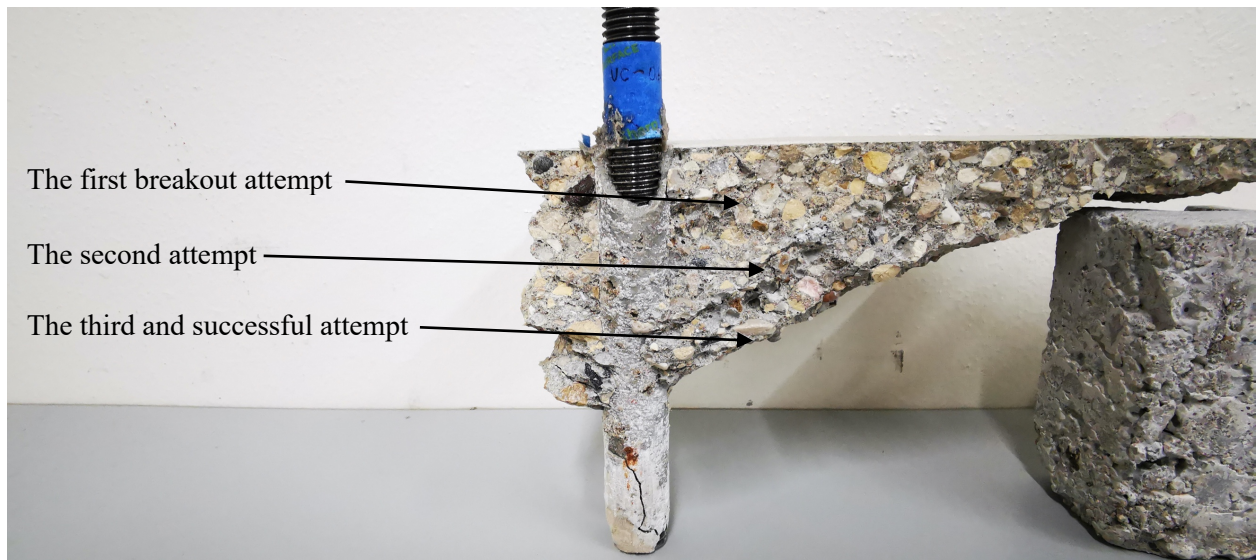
Multiple breakout cracks in Specimen UC-0.625-5.0-#1.
